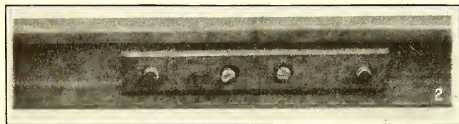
Fishplate with center fillet ready to assemble on joint.
